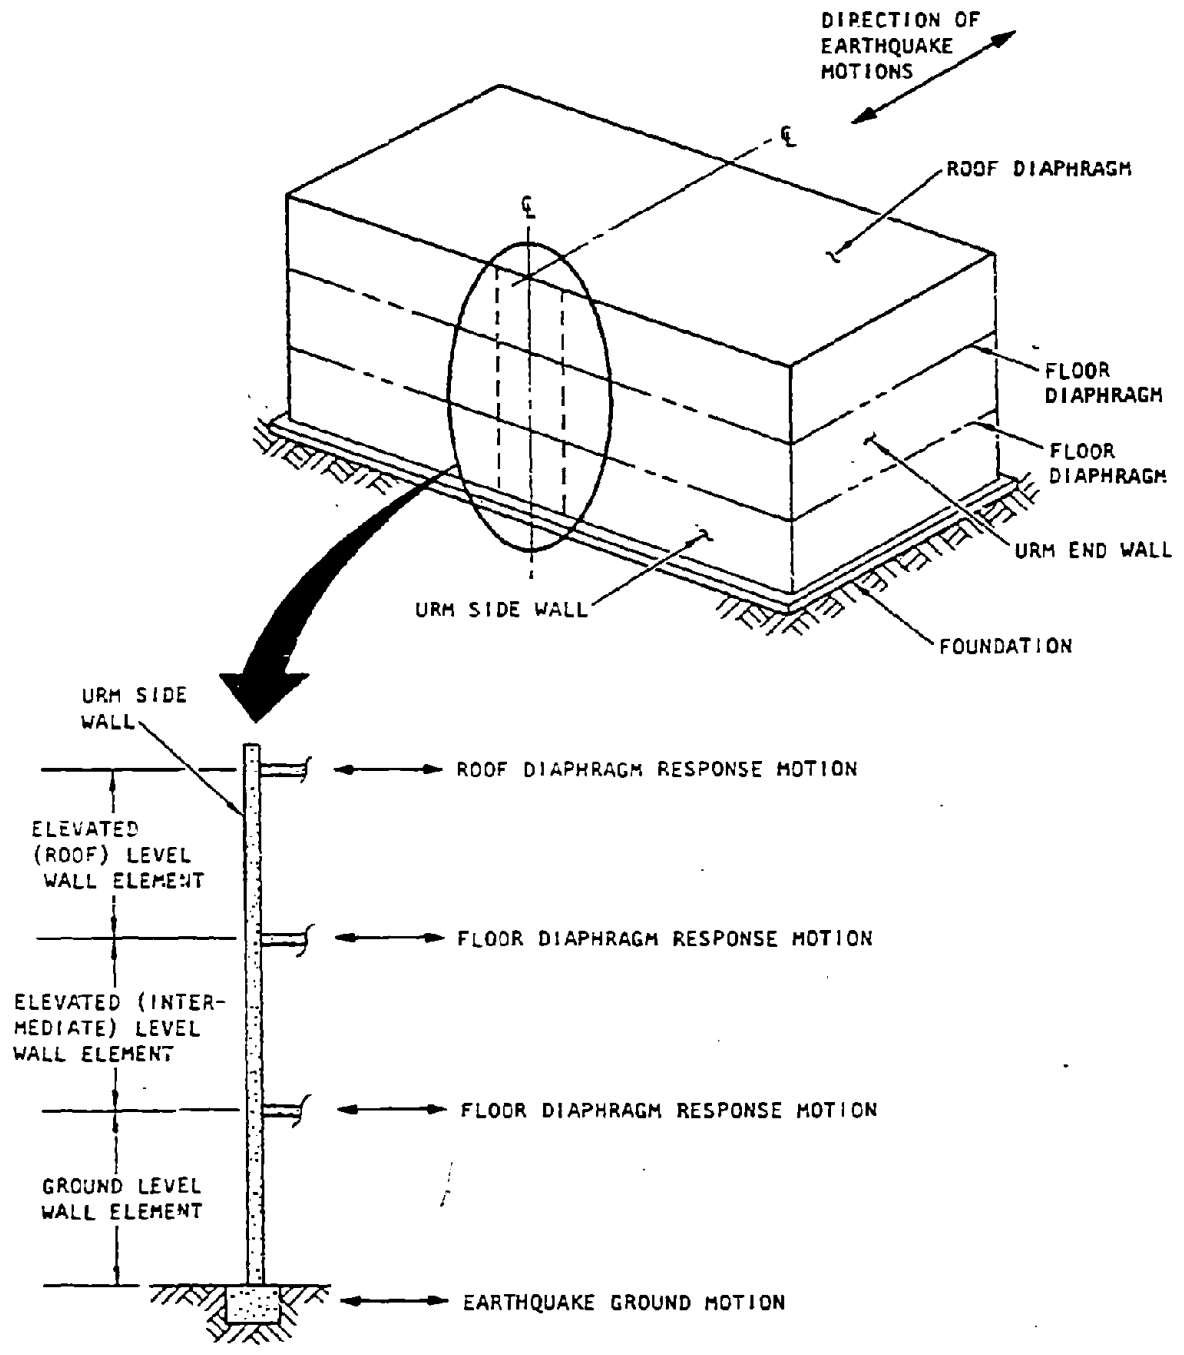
WALLS, OUT-OF-PLANE, MULTI-STORY BUILDING
